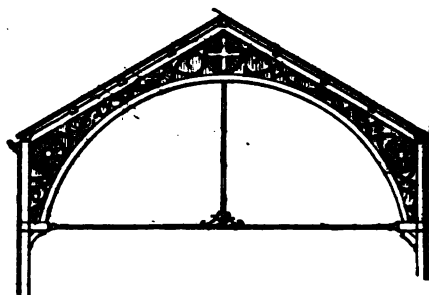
Truss for Metropolitan Concert Hall, New York City
